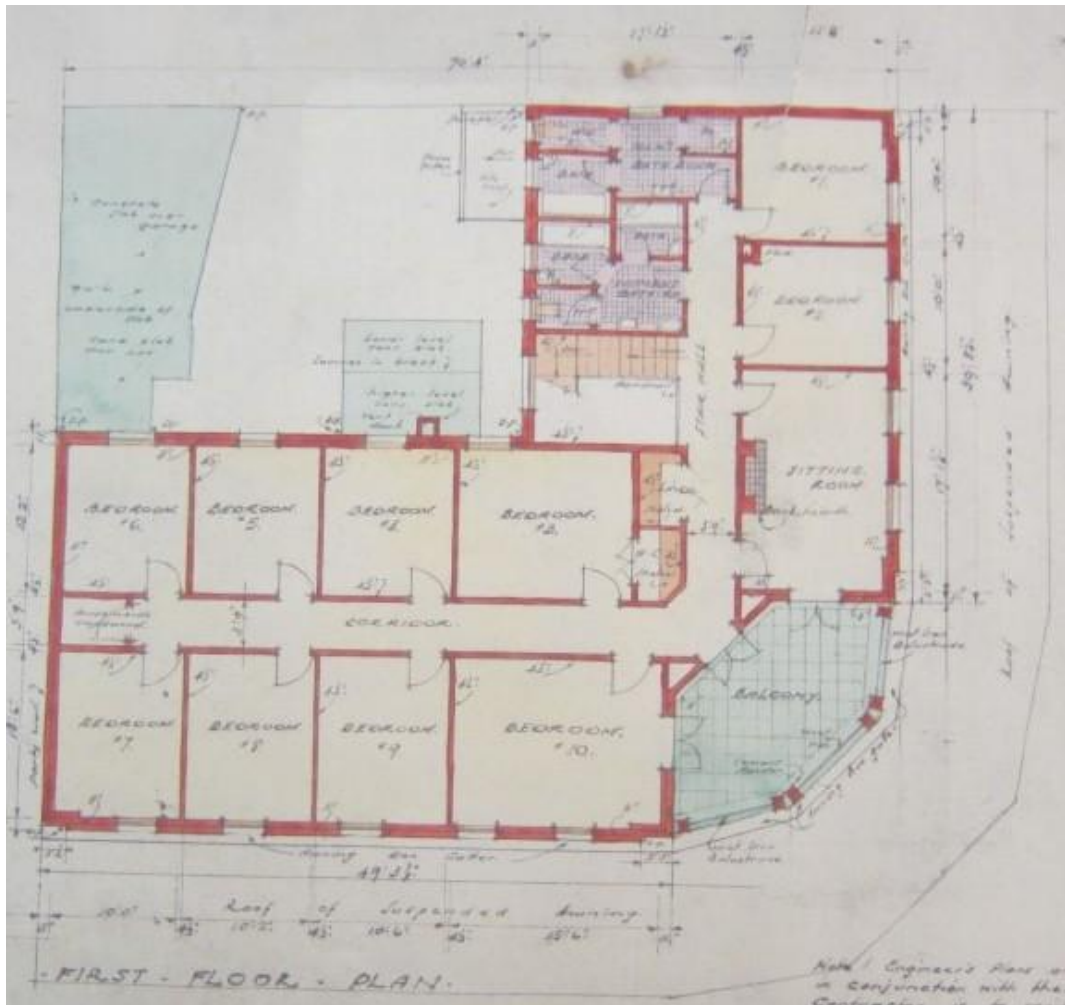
Portion of a drawing prepared in the office of Rudder & Grout during the first half of 1934 describing the first floor plan of the new Alexandria Hotel.
